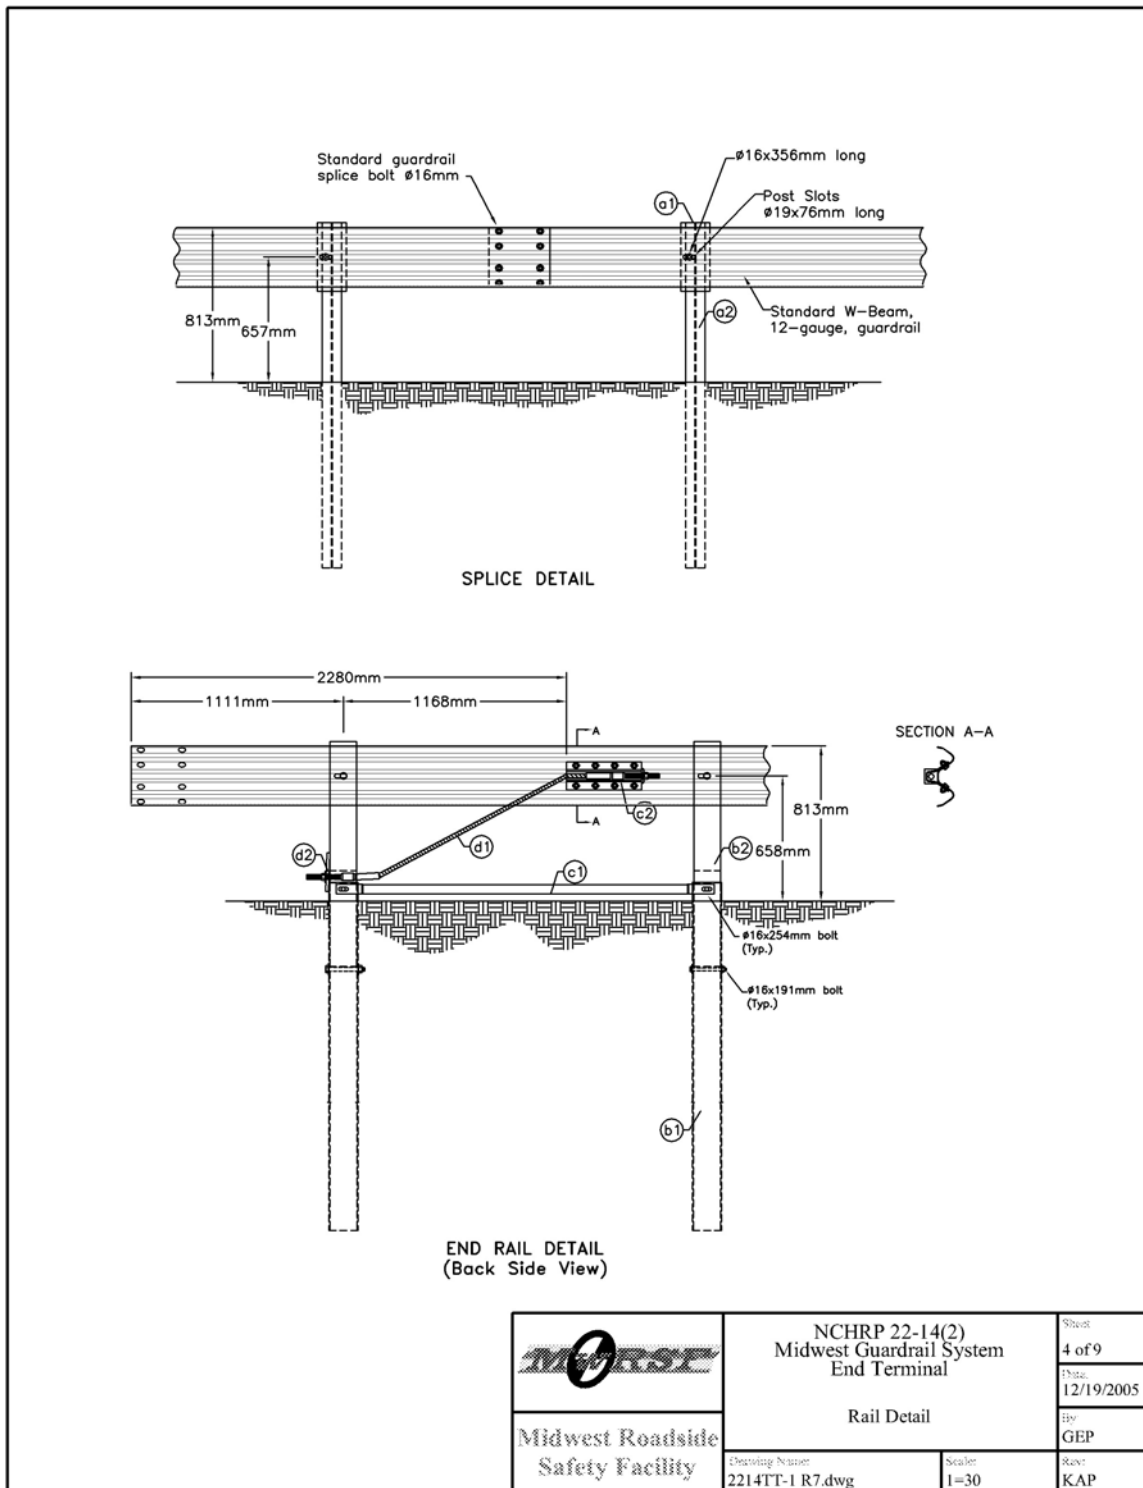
Midwest Guardrail System End Terminal - Rail Details
